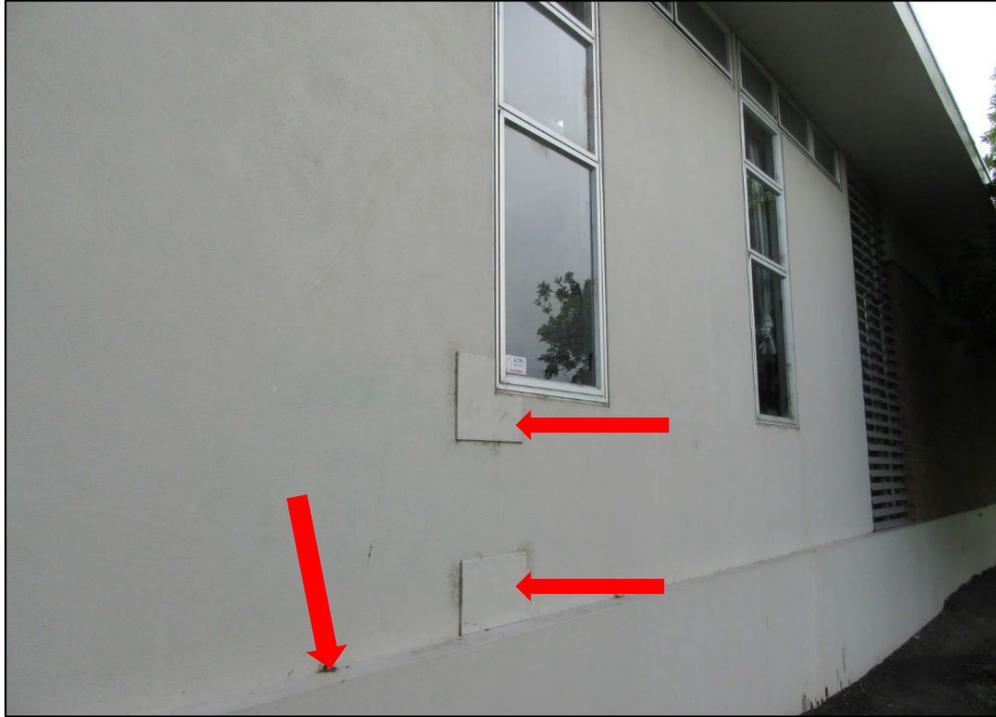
North elevation. Further cracking to stucco cladding junction between aluminium window and adjacent plaster. The defects will be remedied by the recladding recommended for the stucco elevations.
